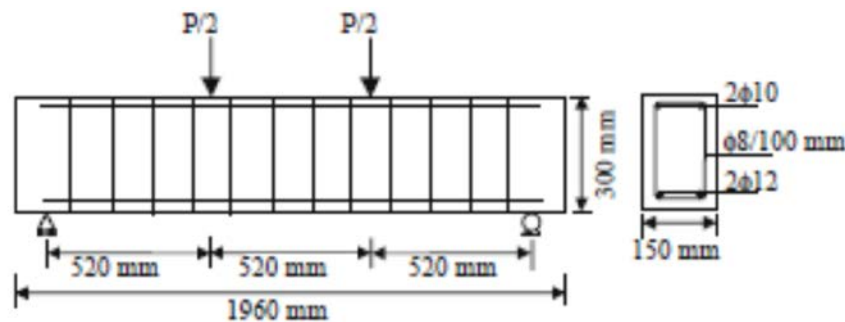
Geometry and arrangement of reinforcement for control specimen (Obaidat et al., 2011)
